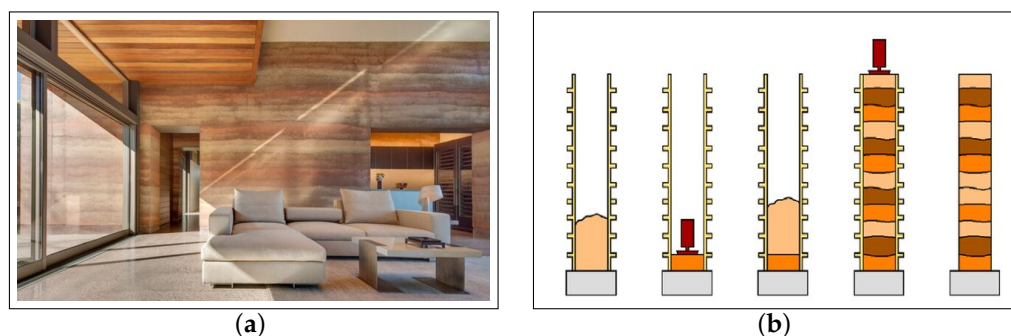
Example of rammed earth construction. (a) House made of rammed earth in New Mexico. (b) The process of building a rammed earth wall.
